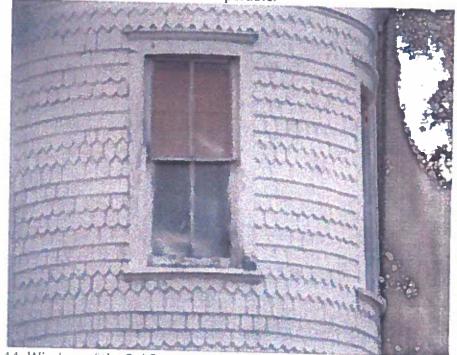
Window of the 2nd floor turret facing east. Panes are broken and window is paint shut. May not operate.
